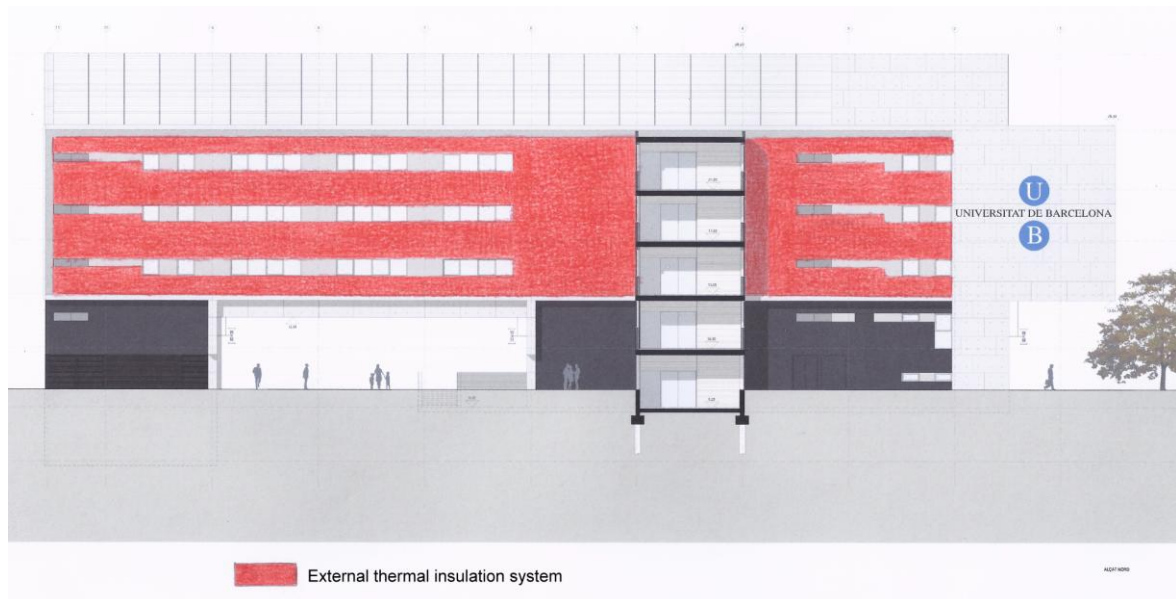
Zone of the North façade where the ext. insulation syst. will be applied
